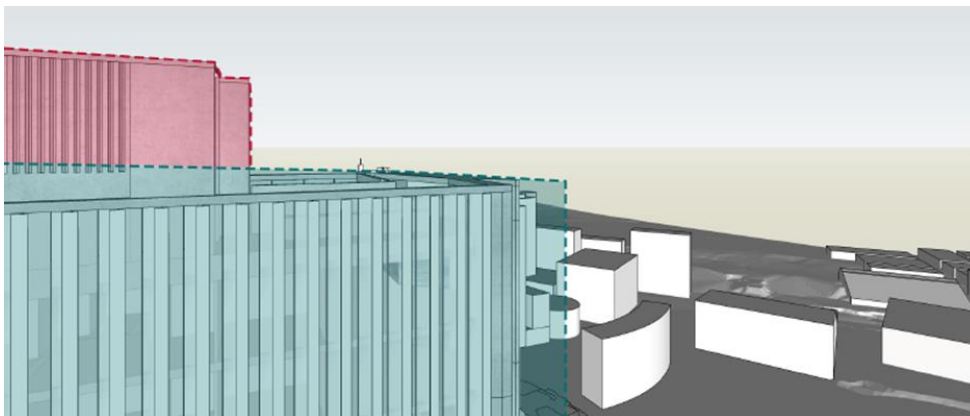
View E.2 - View Perspective from apartment at Level 47, approved building envelope identified in blue, amended envelope outlined in red
